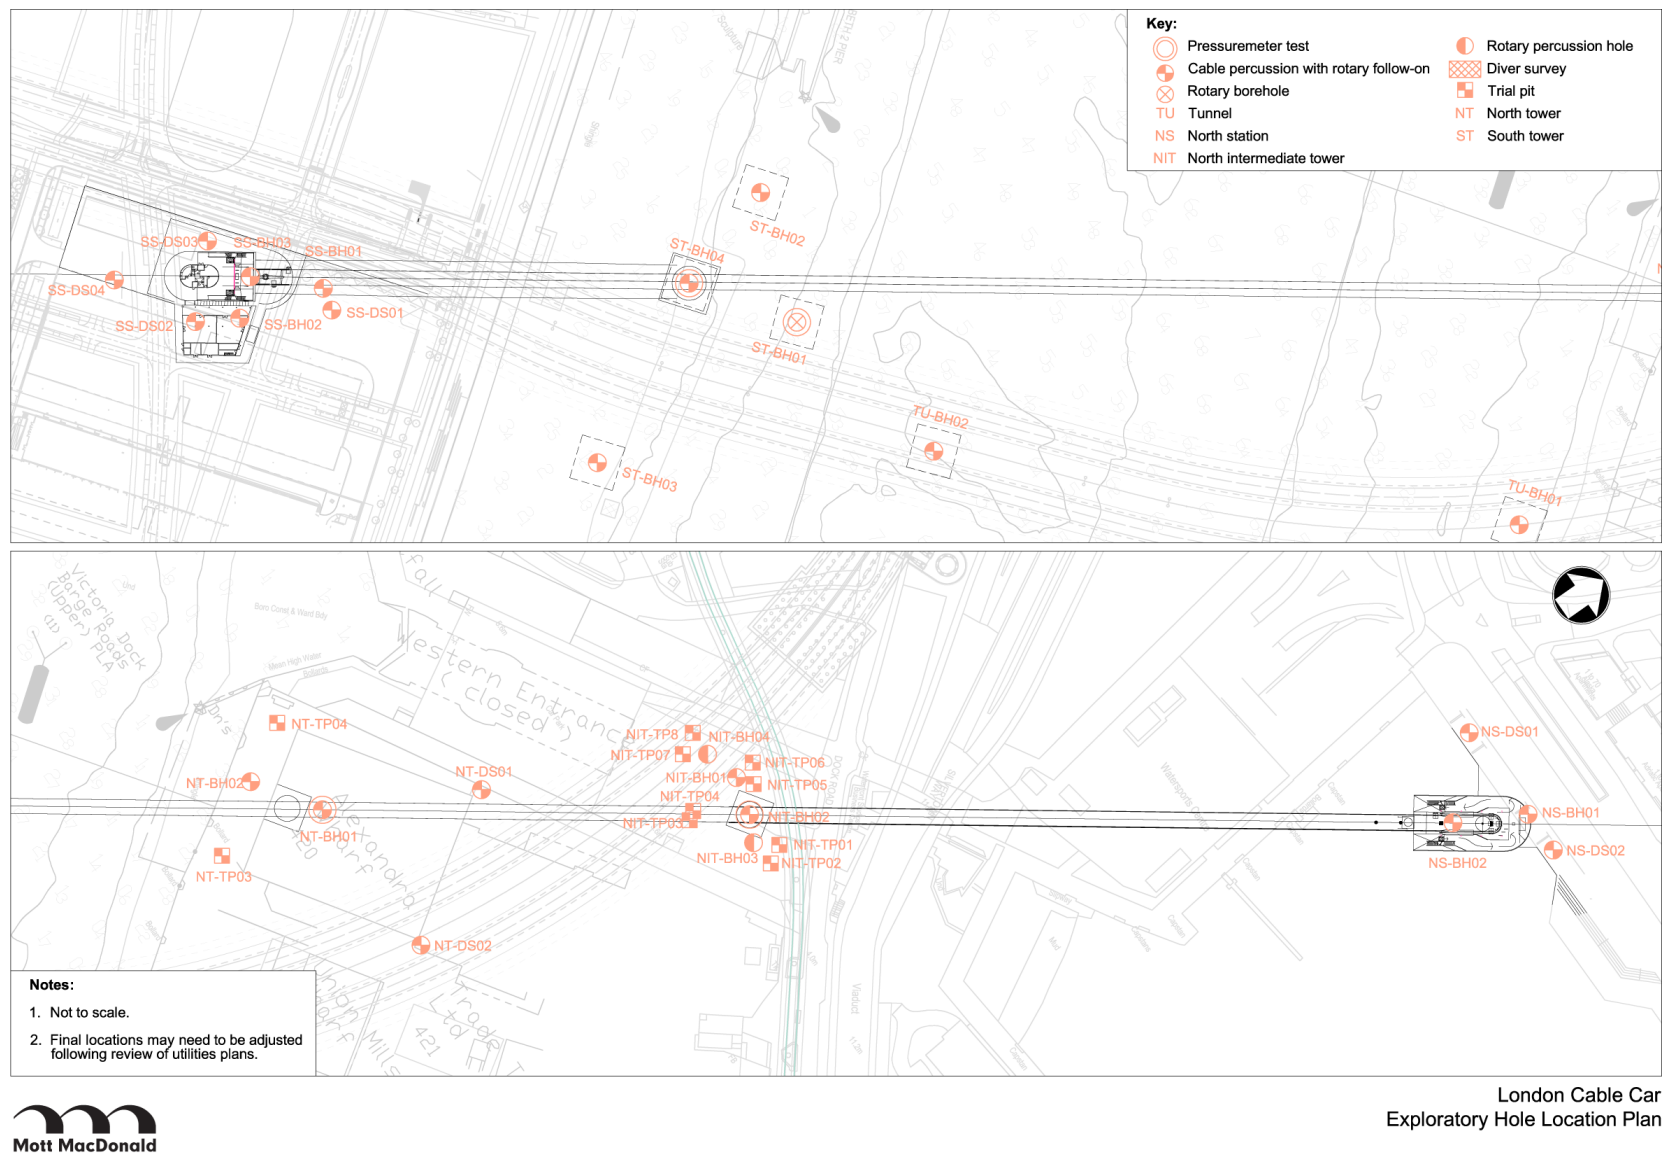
Detailed plan of the Cable Car route, London Boroughs of Newham and Greenwich (site code: CAB11).
